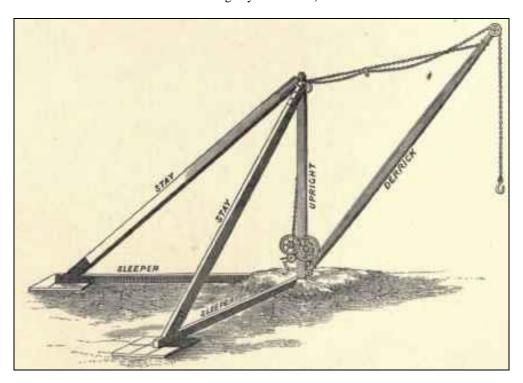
3D view of a Scotch Derrick crane (http://chestofbooks.com/architecture/Building-Construction-3-2/Scaffolding.html#.UzAUl6IqzTo).
